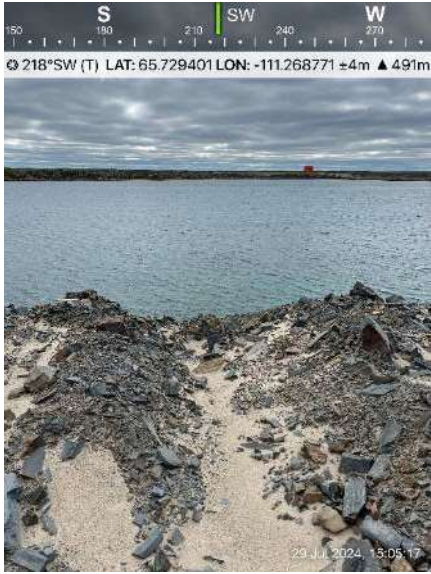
Existing erosional feature near the crest on the downstream embankment at Dam 3D.
